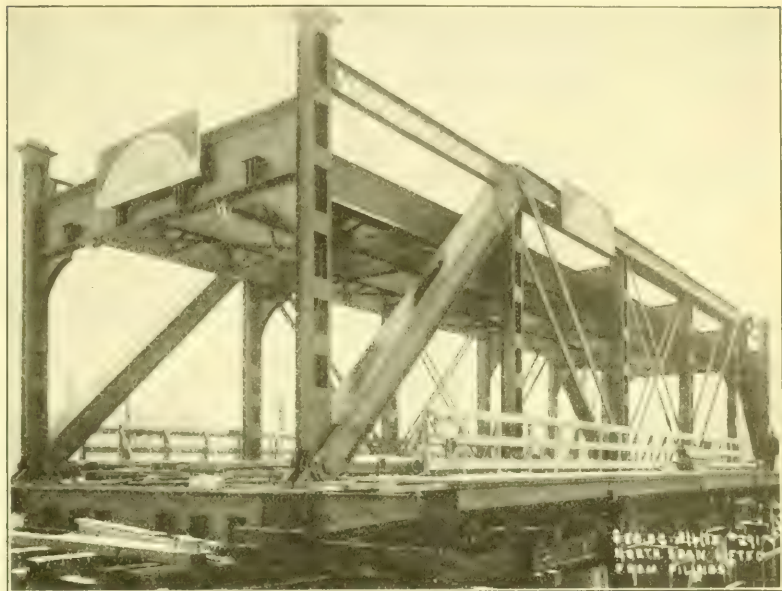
NEW NORTH SPAN OF HARLEM RIVER BRIDGE.
